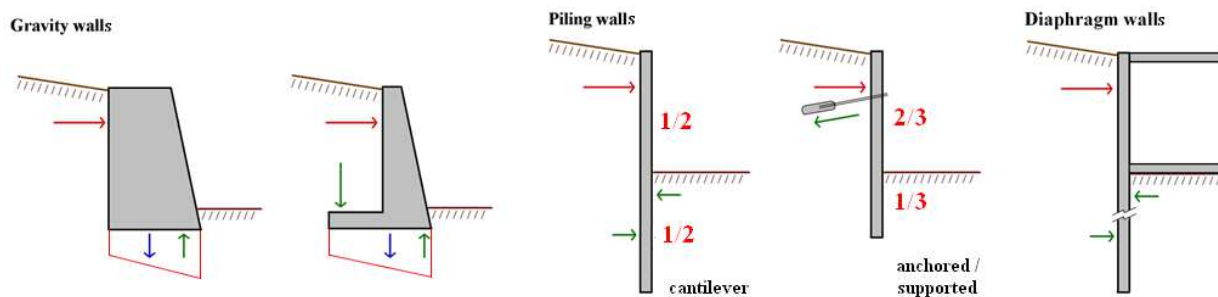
Five types of soil retaining walls (from: Wikimedia Commons, modified)
